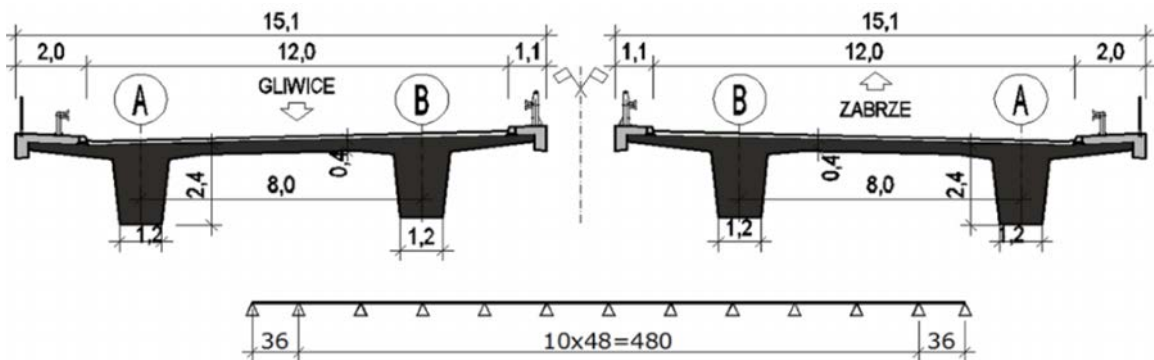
Cross-section and static scheme of the bridge in Gliwice.
